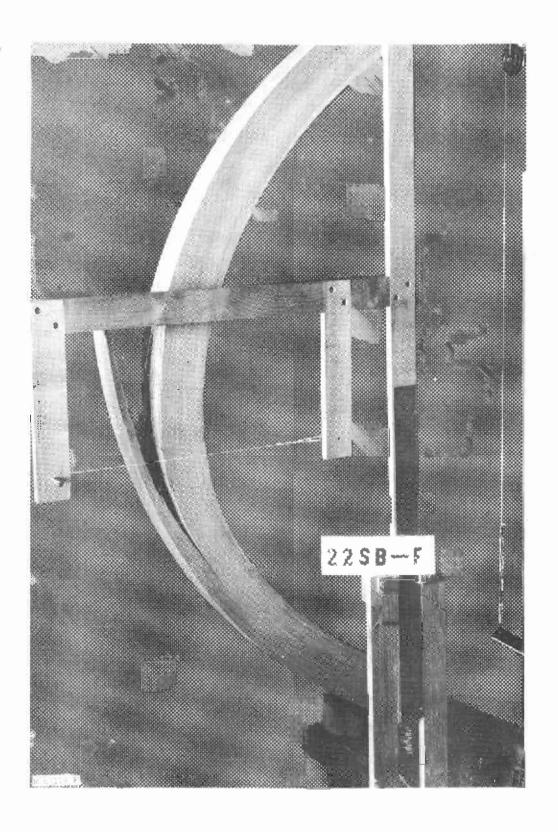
Steam-bent frame in testing machine showing a typical Z M 67742 F failure under end-thrust loading.
